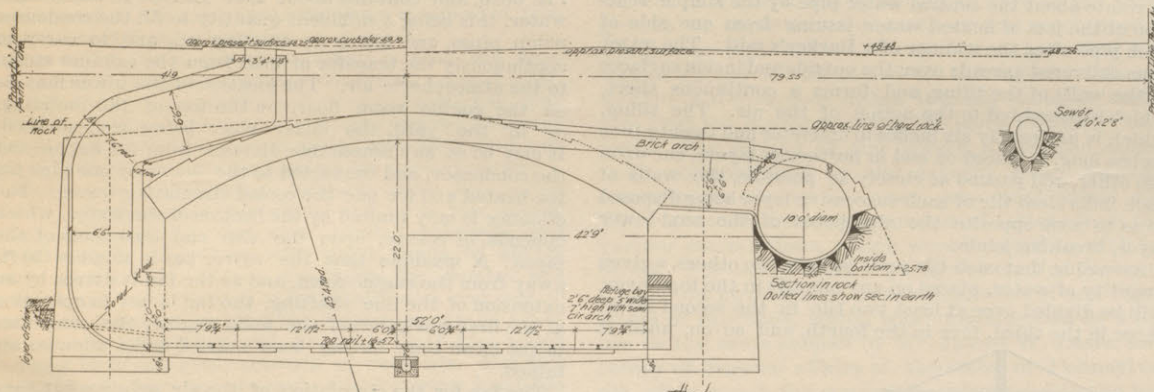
SECTION OF TUNNEL SHOWING VENTILATING AND DRAINAGE SYSTEMS.
